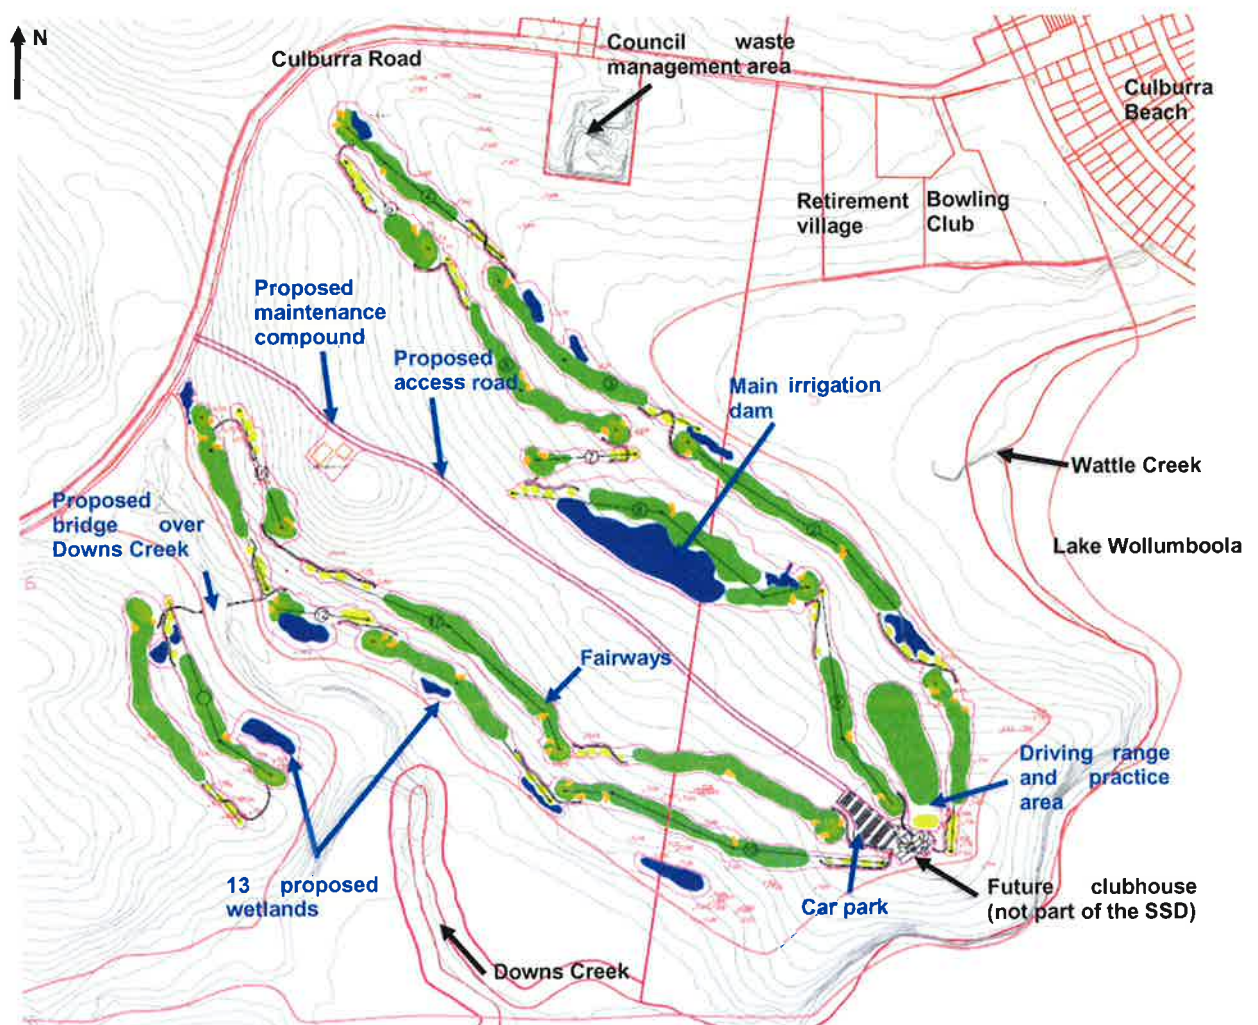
Proposed 18-hole Golf Course, Access Road and Car Park
